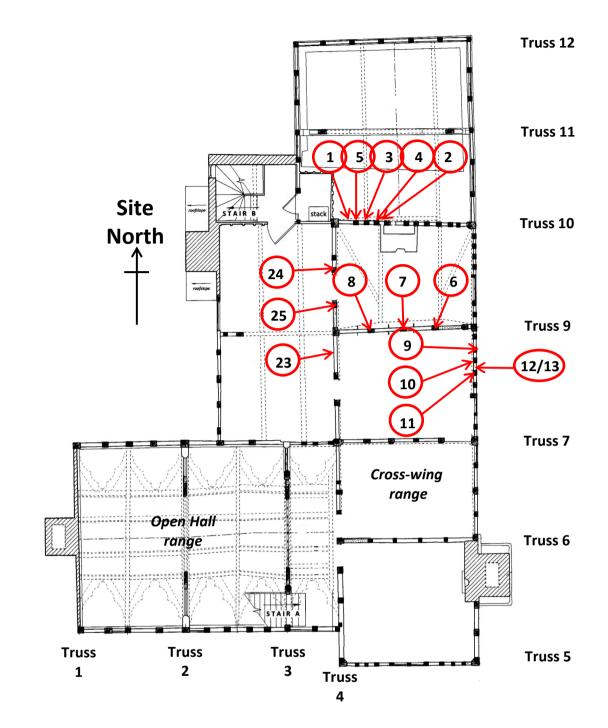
Plan at first floor level to help locate sampled timbers (after Ric Tyler)
